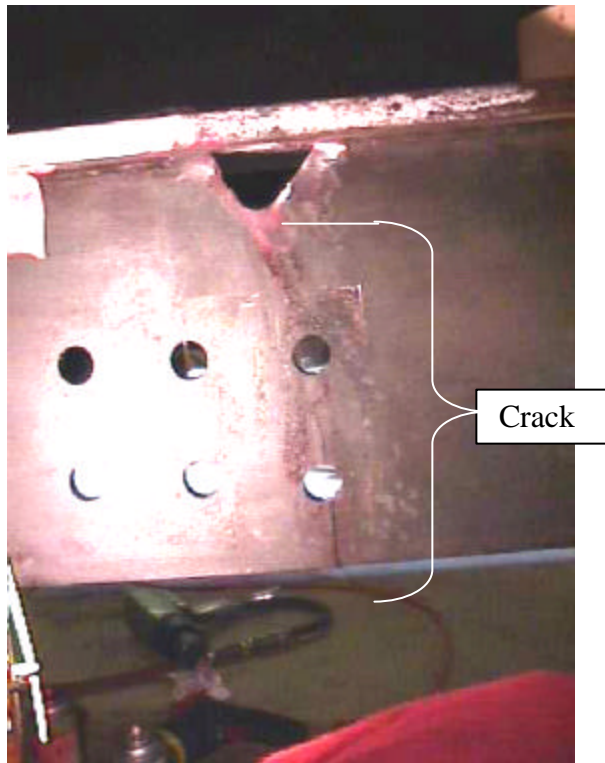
Detail of crack in added web with weld access hole already prepared.
